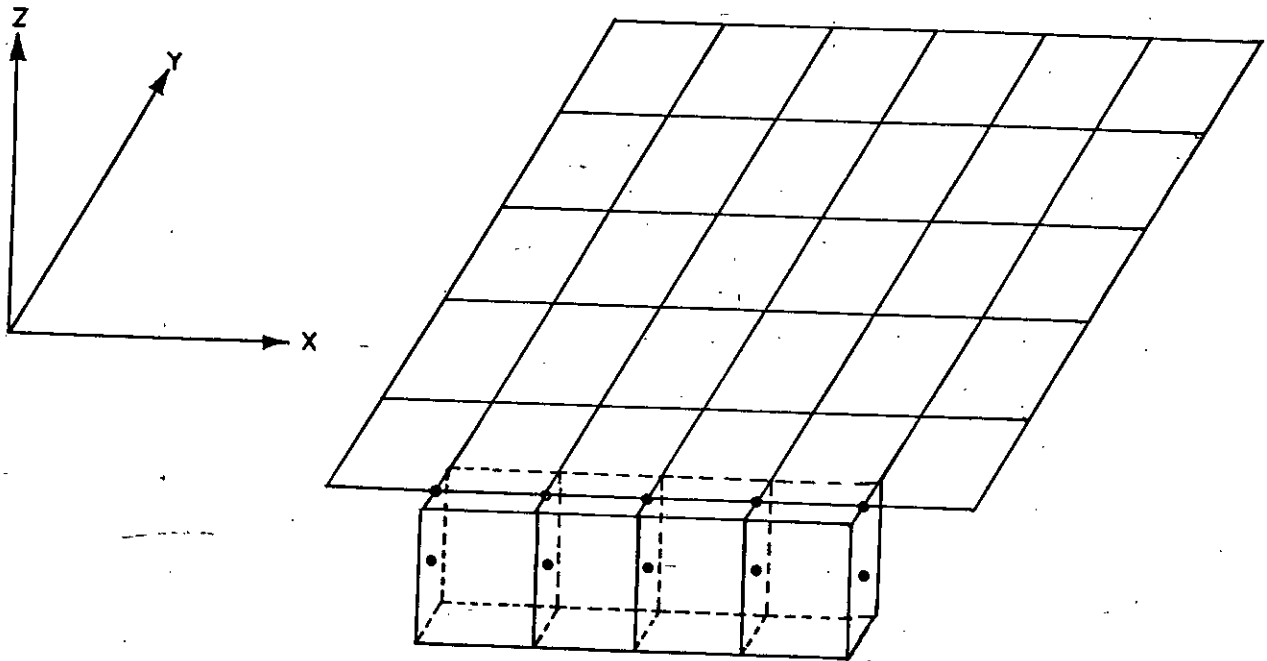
Typical finite element idealization of Beam and floor slab.
